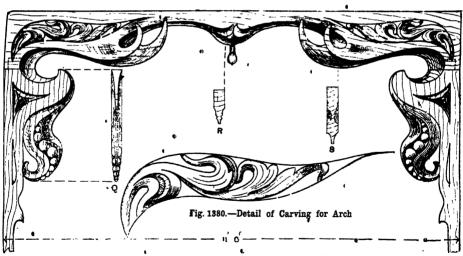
Elevation of Arch for Restaurant or Lounge.
